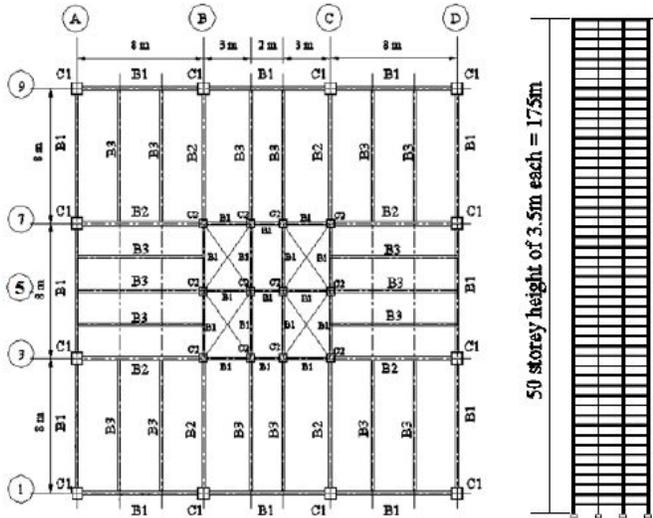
Moment Resisting Frame (Typical floor plan and elevation)
